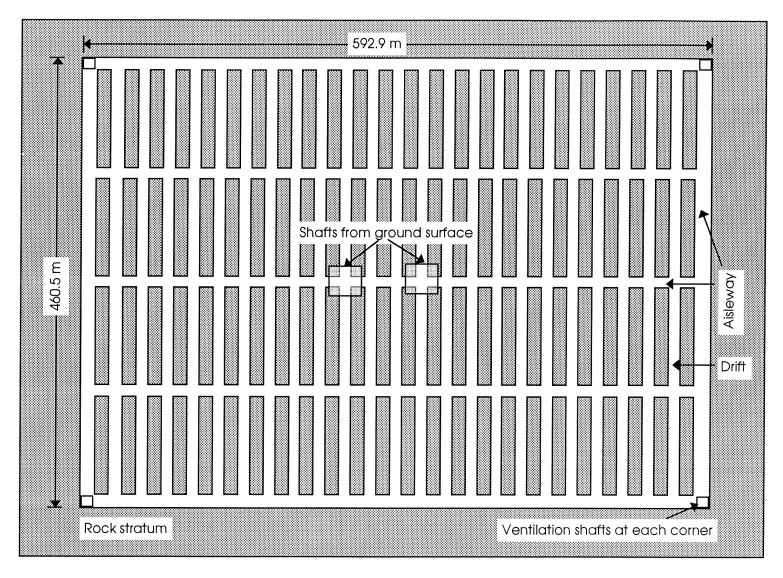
Underground Site Layout of the Mined-Cavity Storage Facility — Uranium Metal, 100% Case
